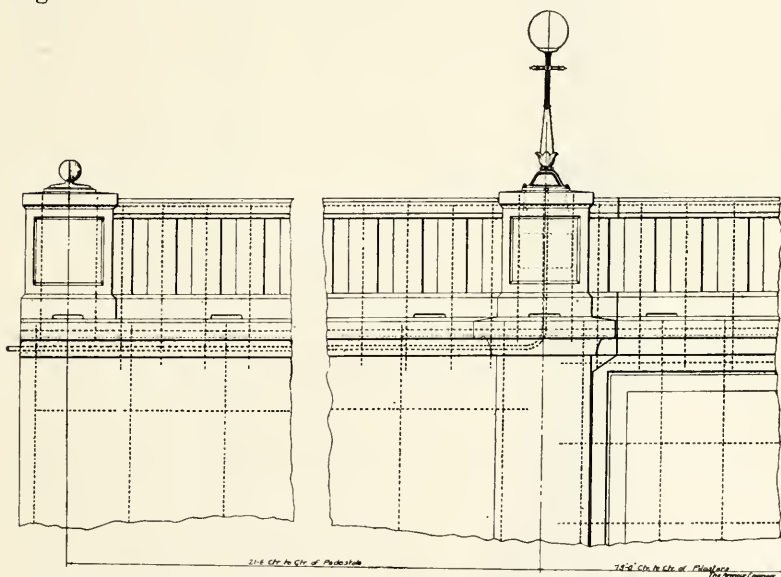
ELEVATION OF HAND RAILING AND PEDESTALS.
